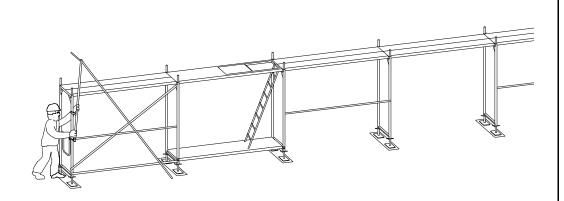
Mounting an advanced guardrail post with end guardrail and telescopic guardrail
